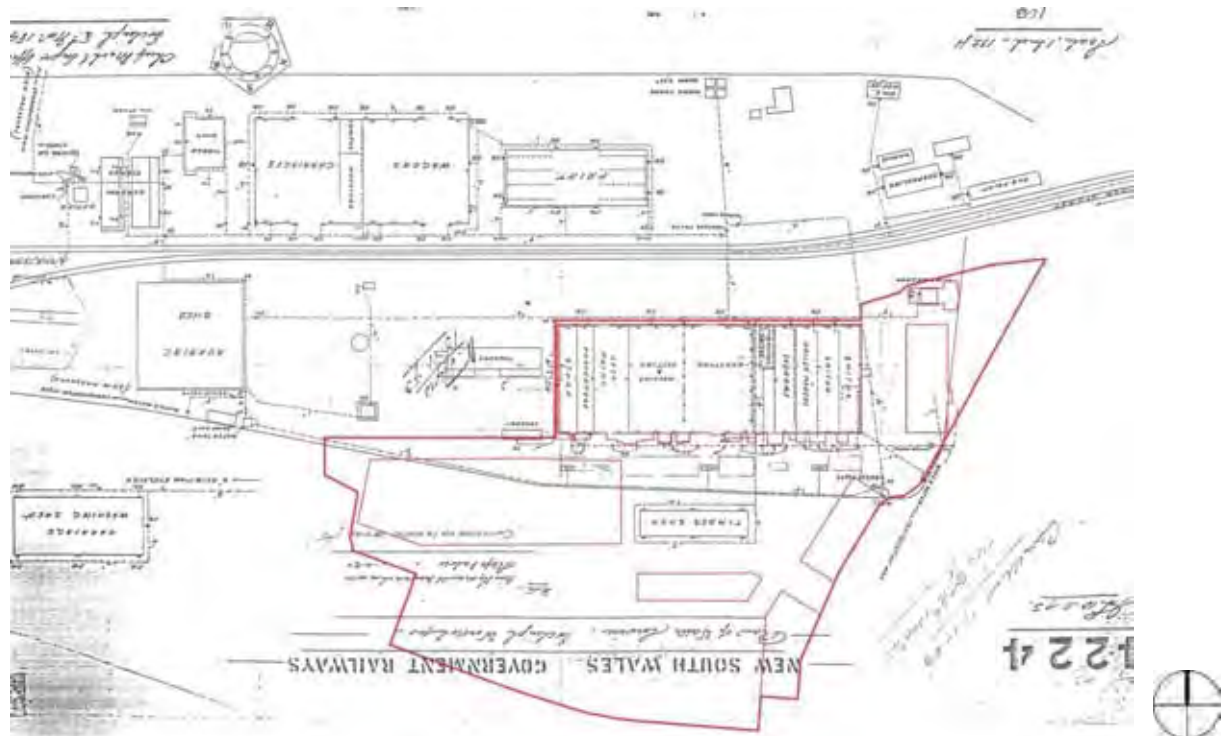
'New South Wales Government Railways: Plan of water service Eveleigh Workshops' from 1898. The new foundry building can be seen to the west of the Locomotive Workshops. (Source: State Rail Authority Archives)
